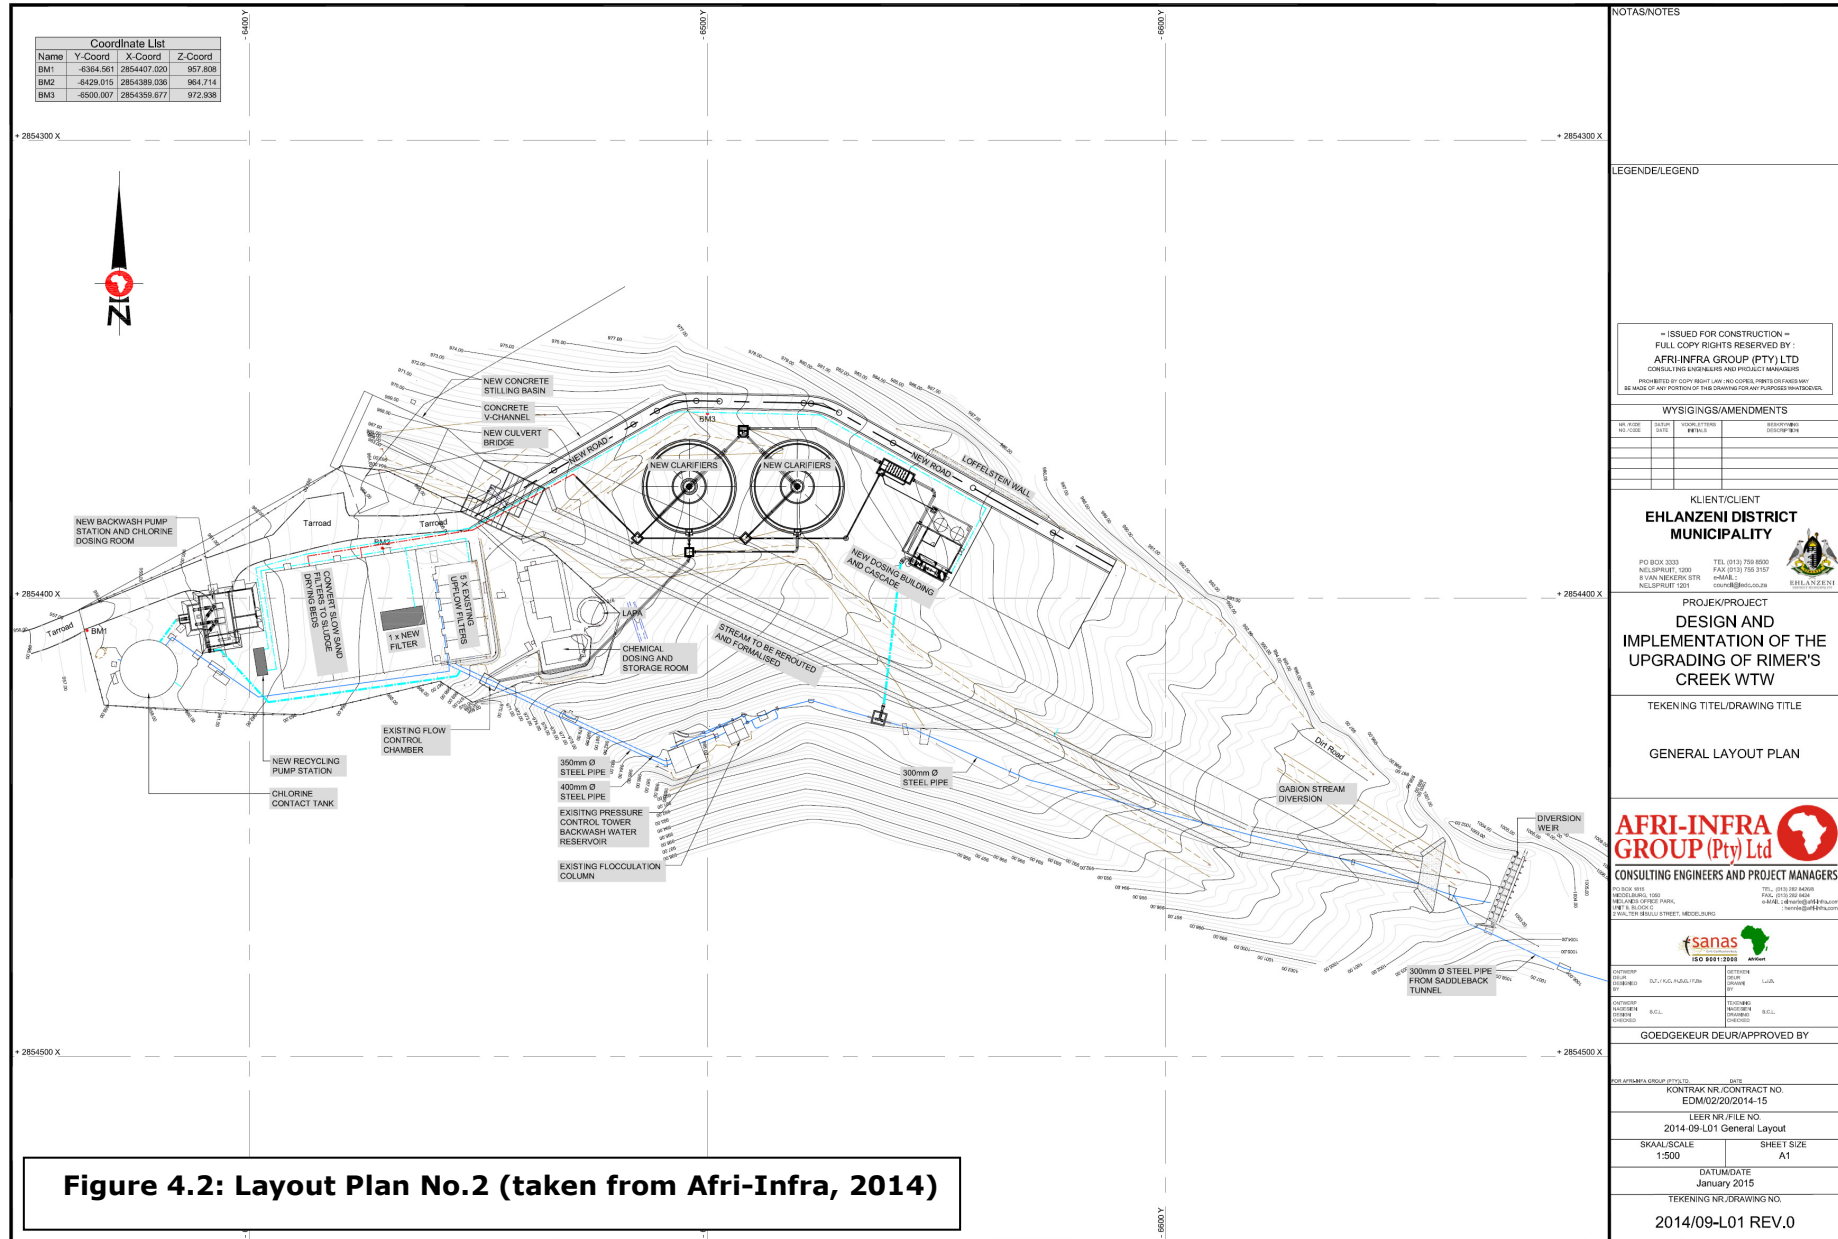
Layout Plan No.2 (taken from Afri-Infra, 2014)
